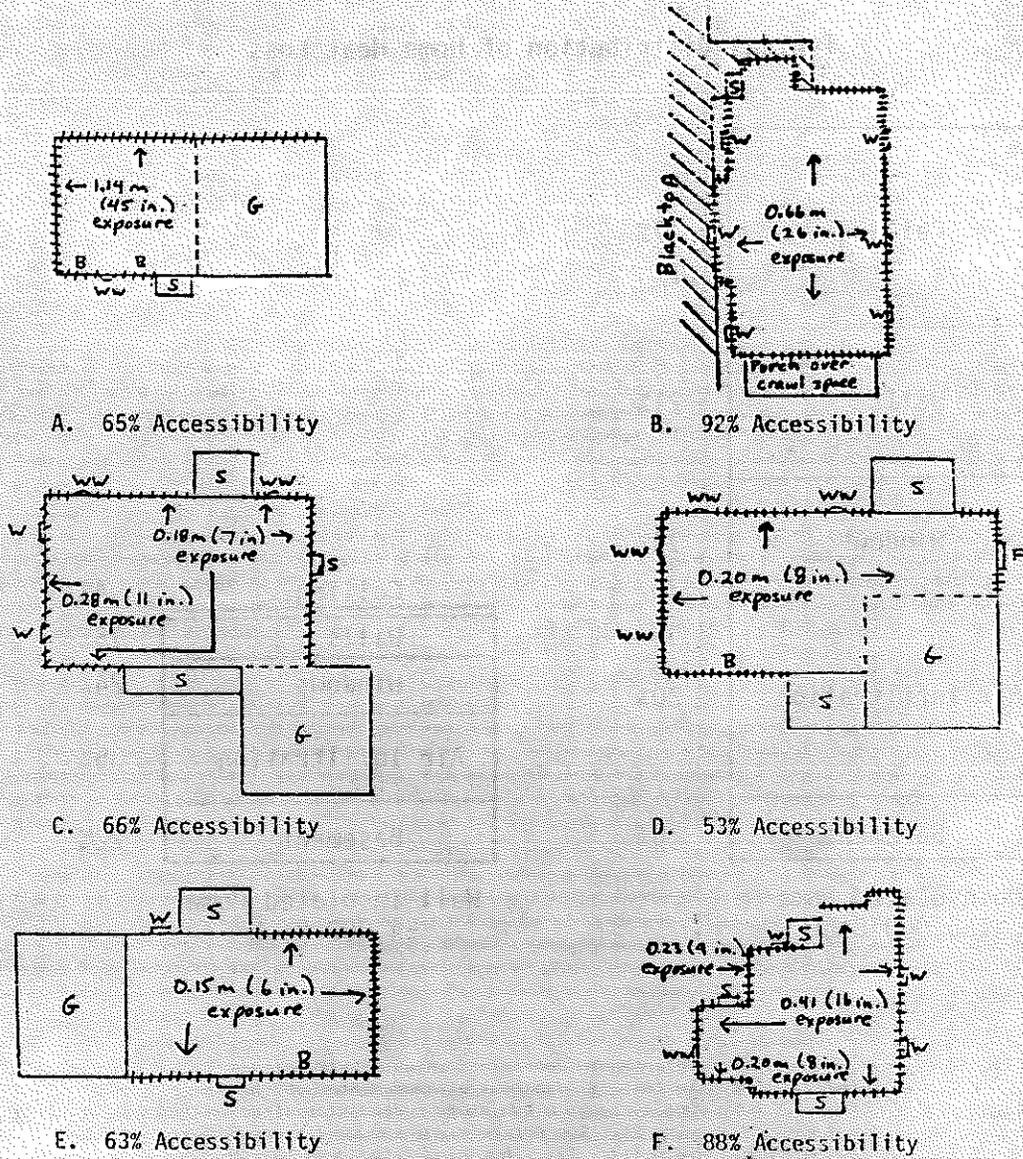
Key: Brick exterior (B); slab, steps, or porch (S); garage (G); window (W); window and window well (WW); fireplace chimney (F); insulated portion of the perimeter
